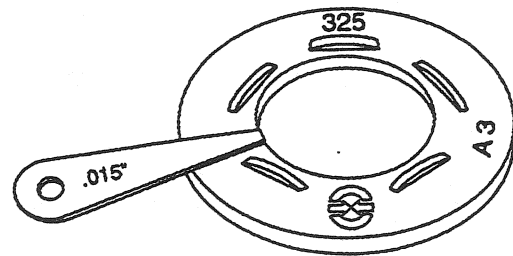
Proper Method for Reading DTI Gaps Using a Taper Tipped Feeler Gauge
